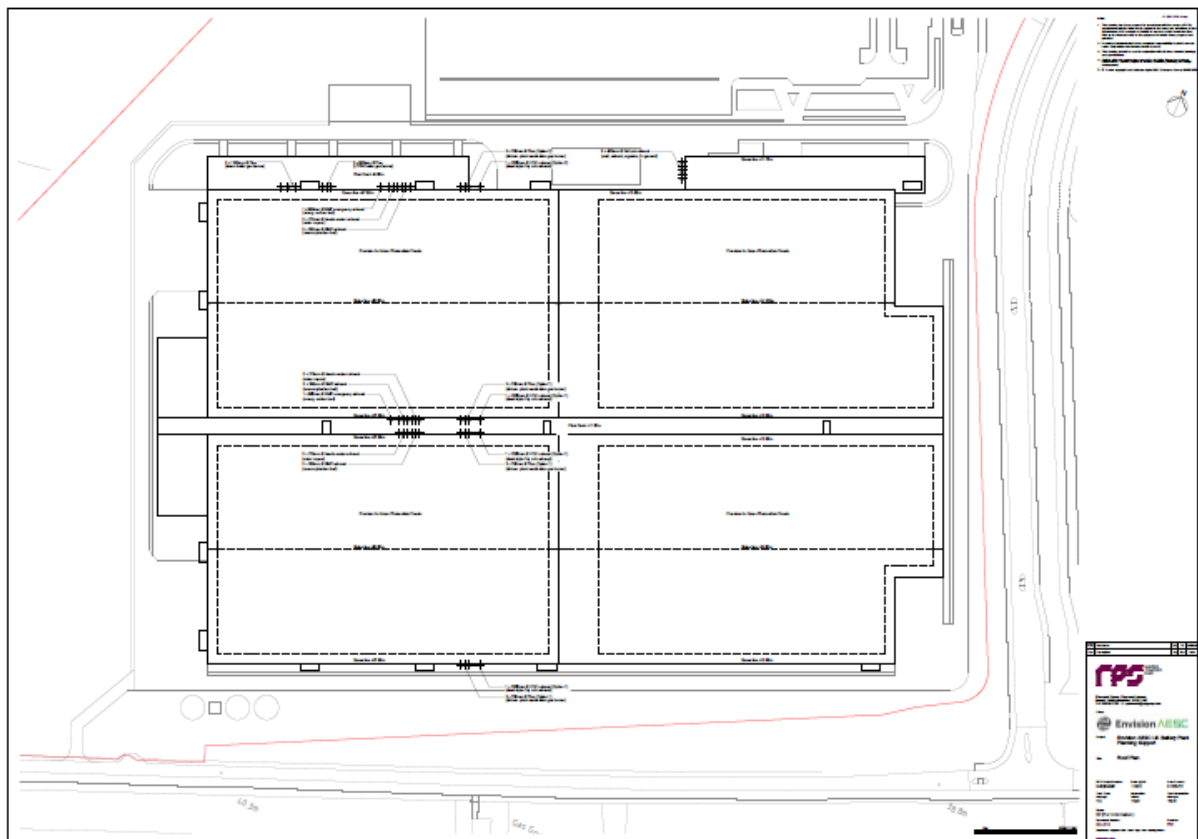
Envision AESC UK Battery Plant – Roof Plan
